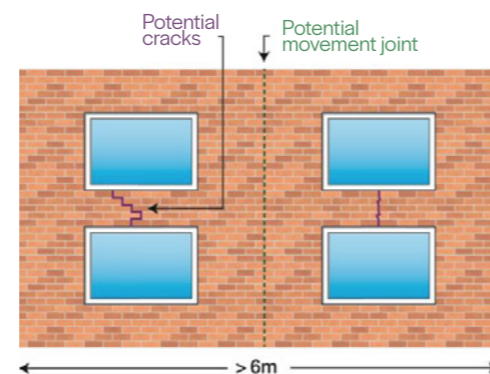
A long uninterrupted run of brickwork between upper and lower windows can lead to cracking at the smallest height, i.e. between the windows either as shown or from the corners of the windows. Cracks may be vertical or stepped – they follow the line of least resistance.
